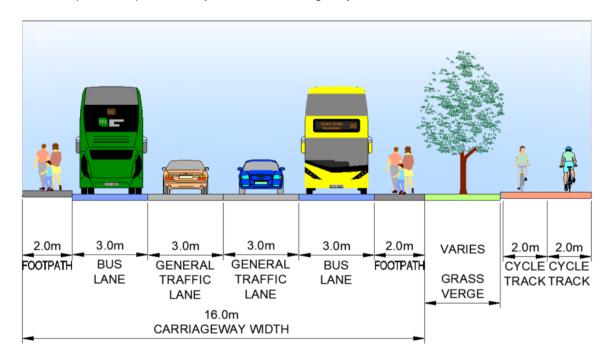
Section 2 Option 4 Indicative Cross Section
